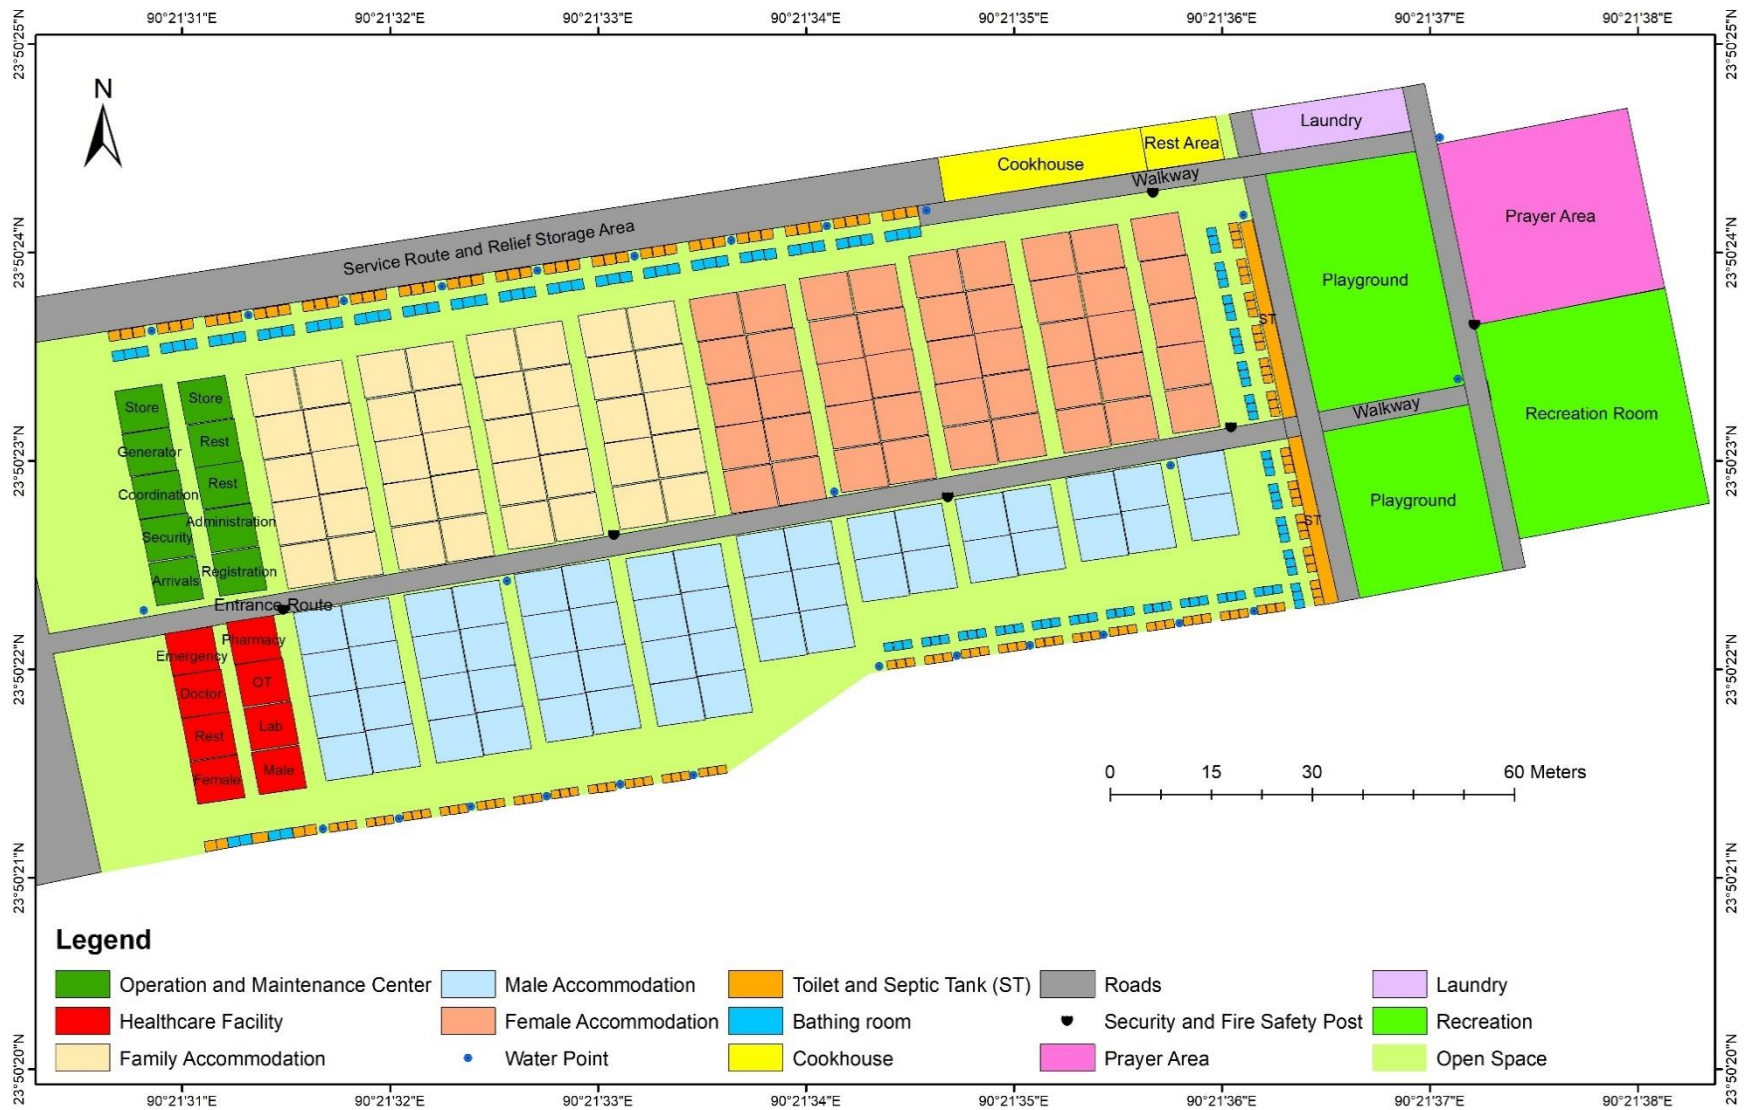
Plan View of Open Space Shelter Model on BUP Playground
